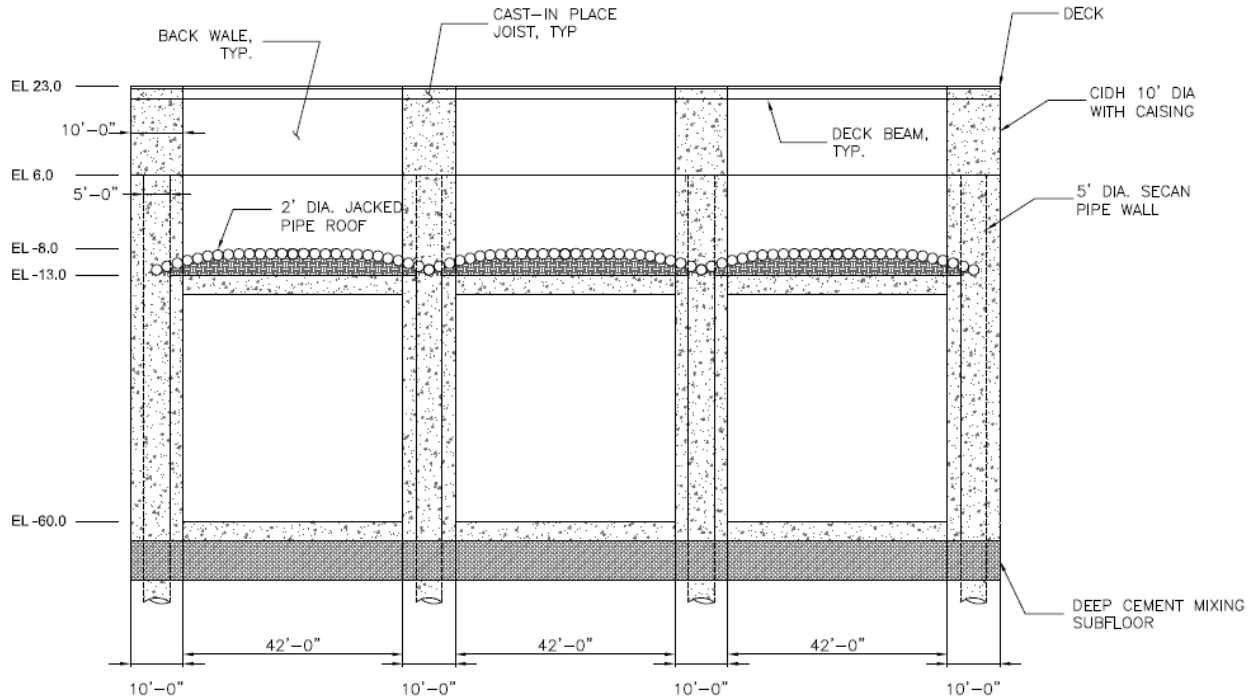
Alt. C – Alternate Cross-Sectional View of the Submerged Box Culverts, Illustrating How Jacked Pipes Could be Used to Form the Roof if Preferred (note eductors are not shown)
